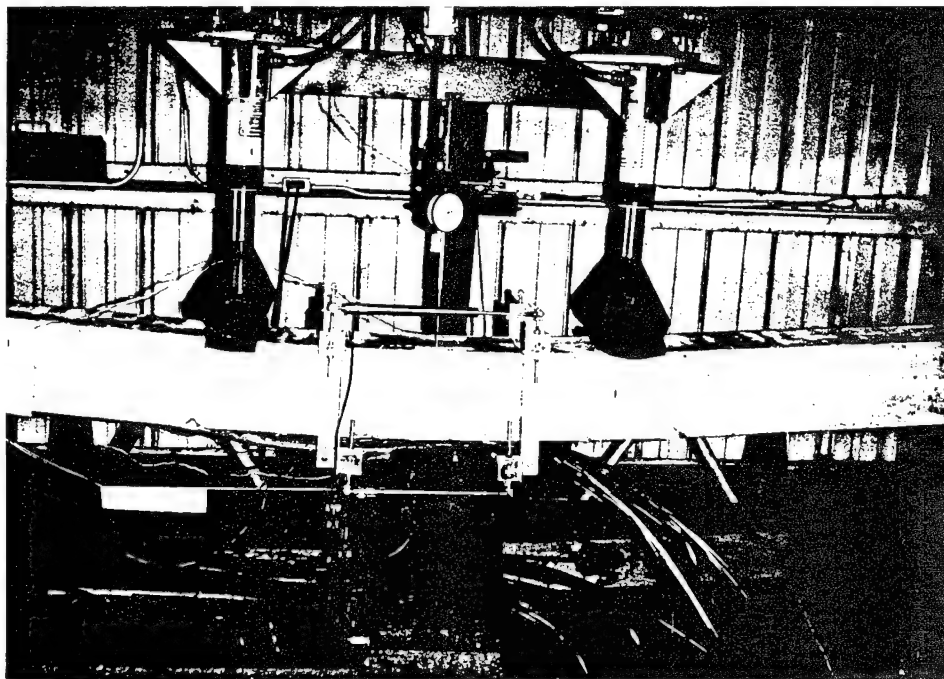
Photograph of beam failure by delamination for a Series 3 beam.
